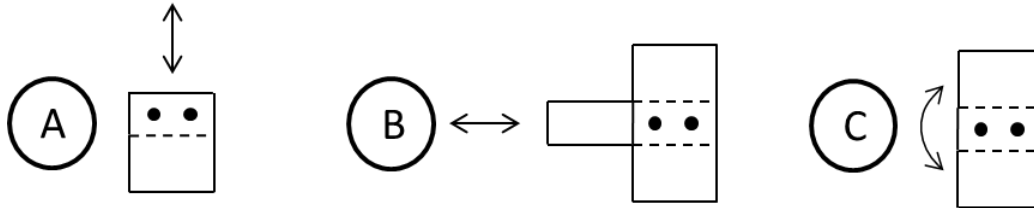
Specification of test specimens: A – loading perpendicular to joist, B – loading parallel to joist, C – loading in torsion
